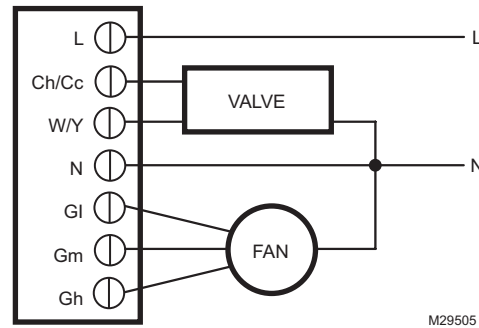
Typical wiring for ON/OFF control in 2 pipes Heat/Cool/1H1C (For 3-wire valve actuators).
